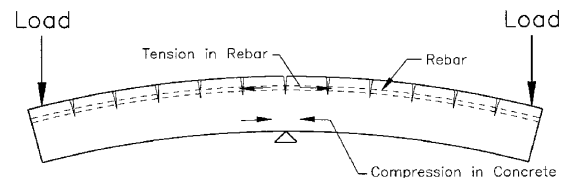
(c)—Properly placed reinforcement in this cantilever beam will resist tension and control cracking.
